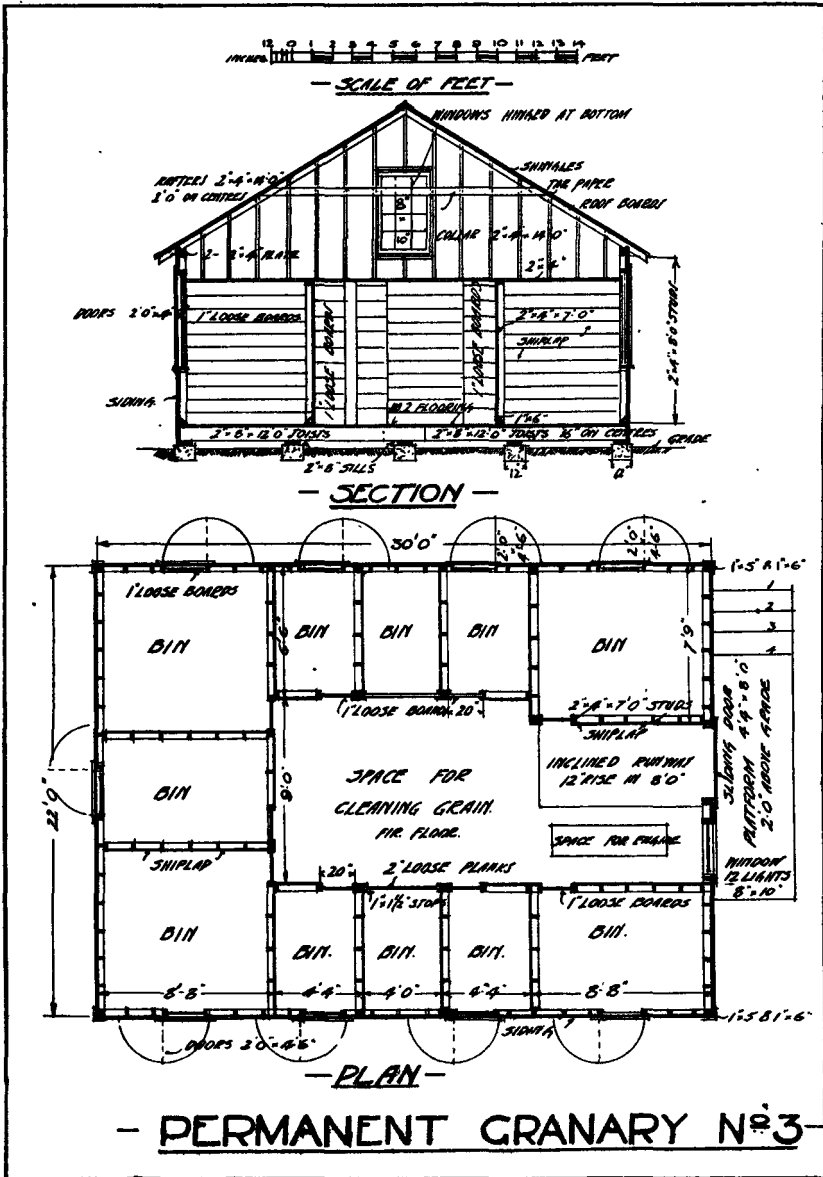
All the eleven bins open to the central space as well as to the outside. The central space can also be used for storing grain.
